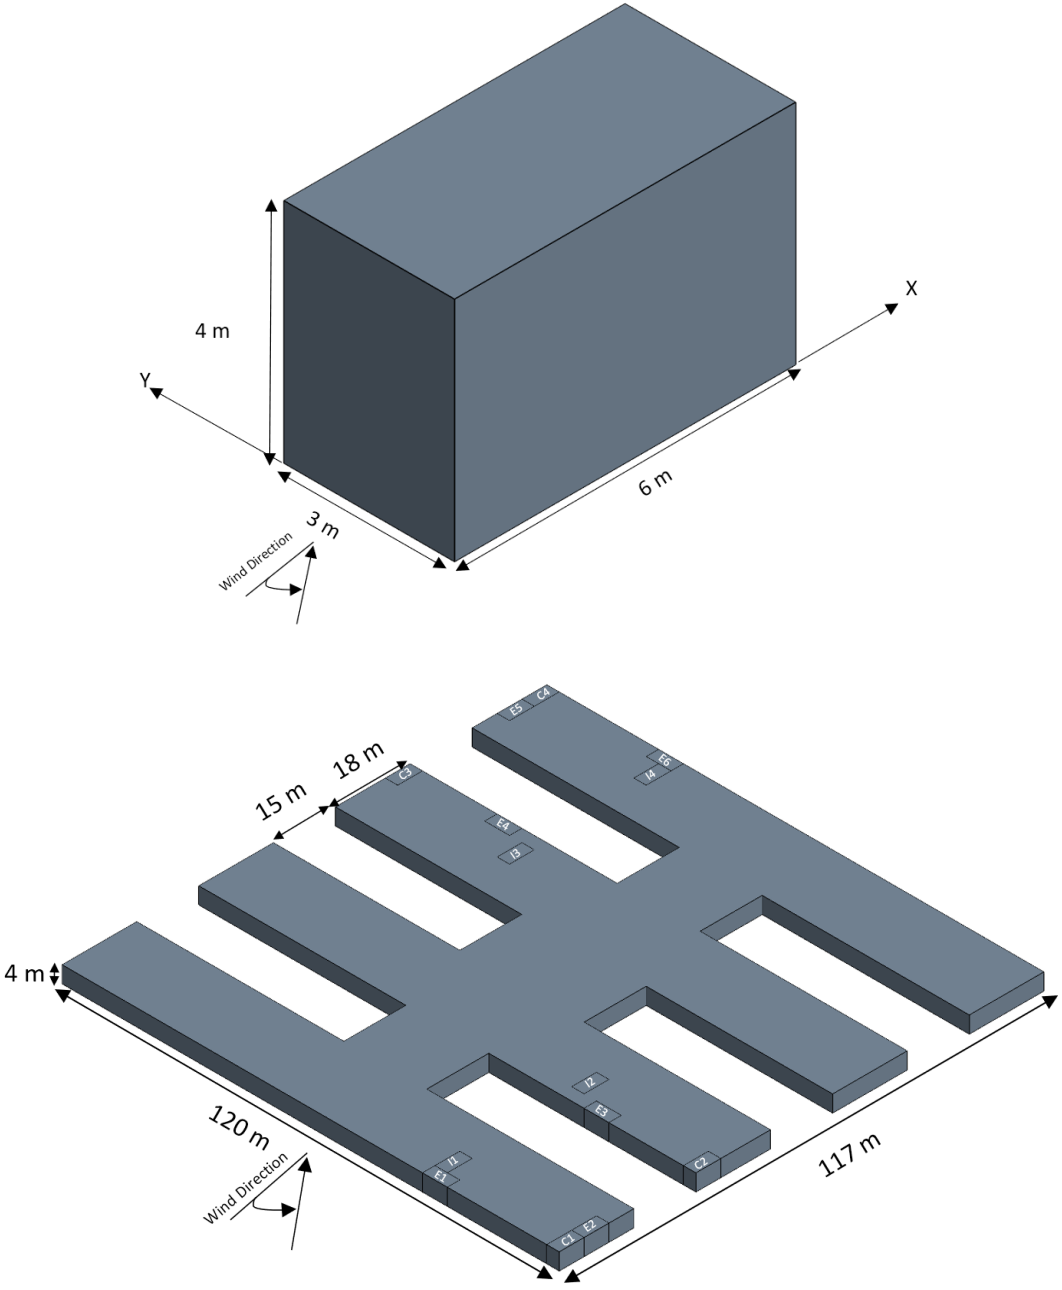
(a) Full-scale geometric details of a single module (b) full-scale geometric details of multi modules building
